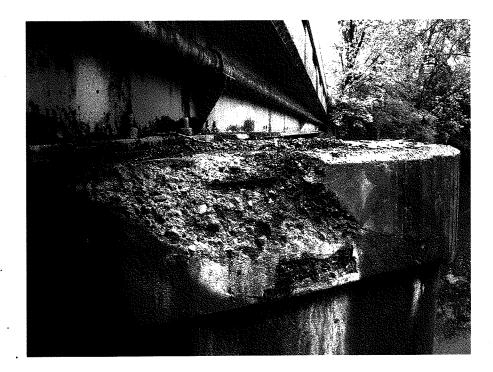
Spalling and Cracking at Southeast Corner of East Backwall
